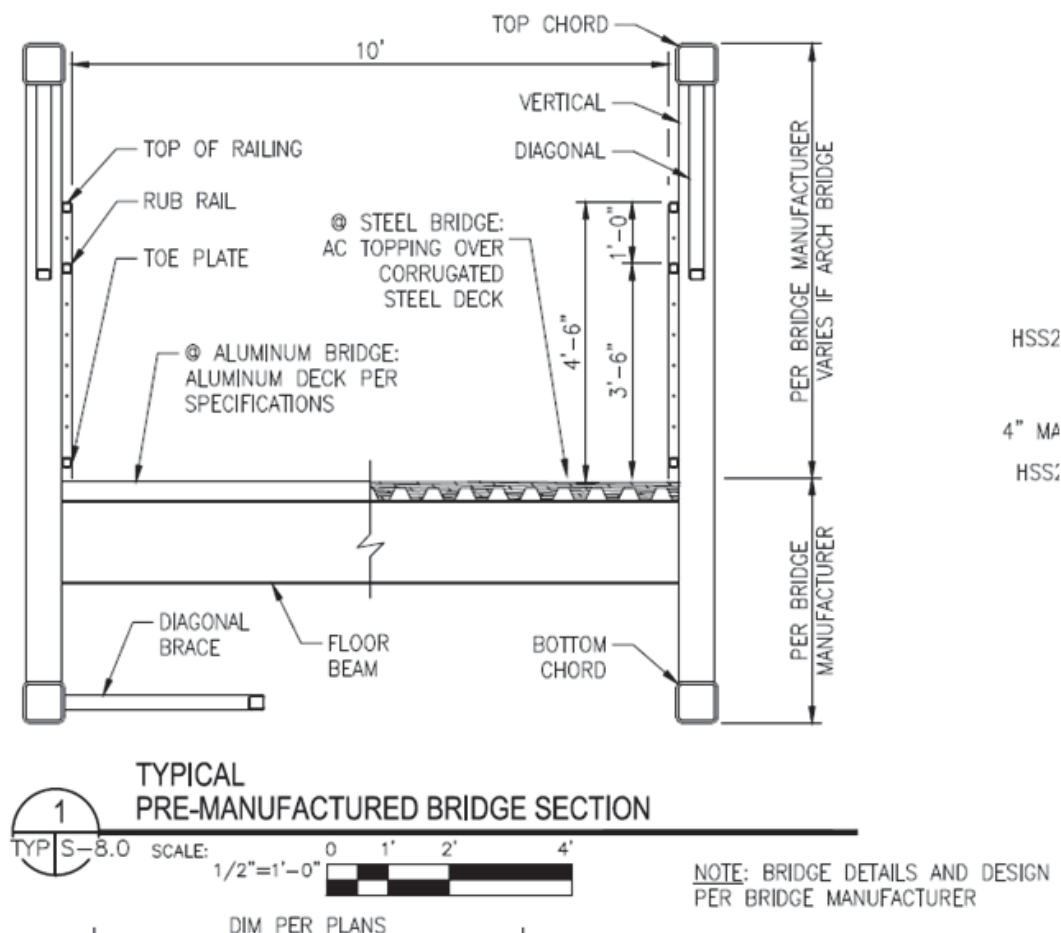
Typical cross section showing height of railings on elevated causeway and viewing platform, designed to meet City Building Code and ADA regulation requirements.
